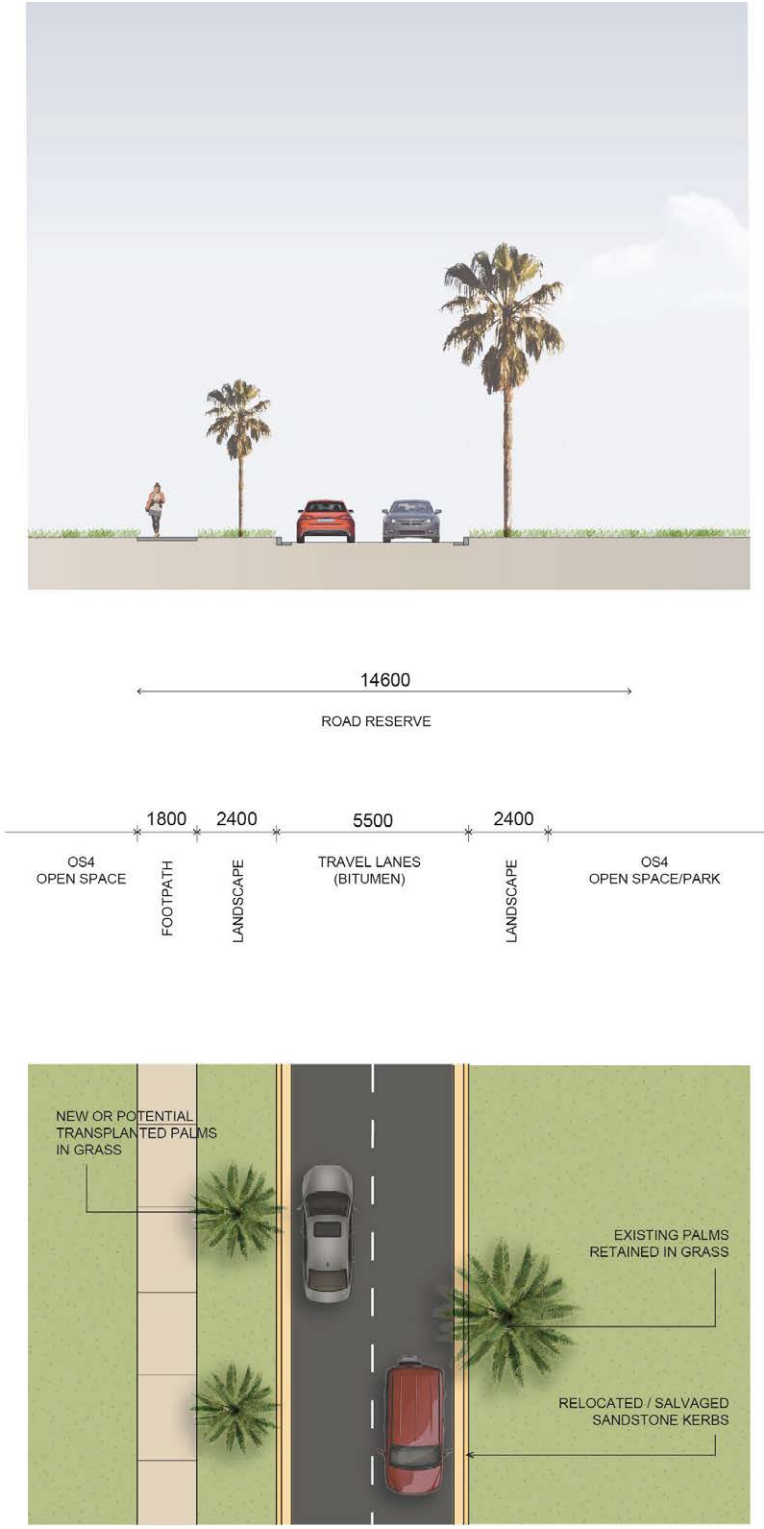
Typical street section 2 – Greenup Drive
